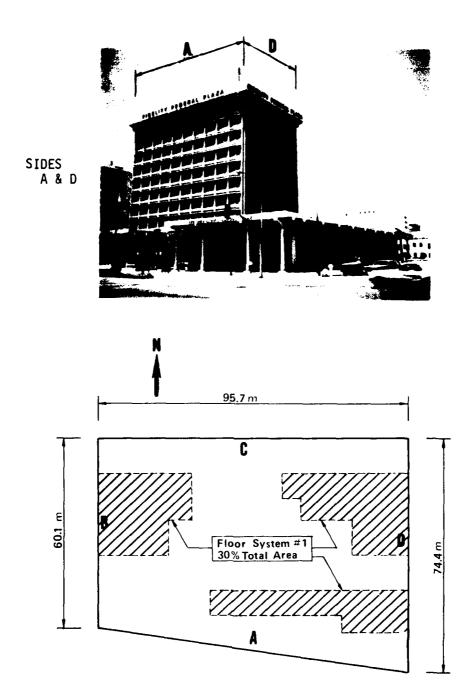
BLDG 220, FIDELITY FEDERAL PLAZA, Long Beach, CA - Photograph and Plan of First Basement (Upper Parking Level)
